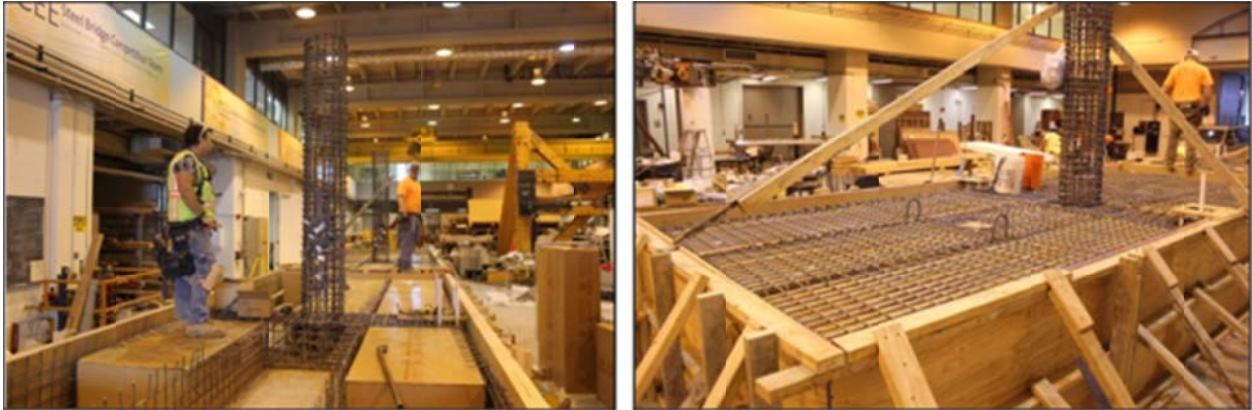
Installing custom-made cardboard boxes for box-section (left) and furnishing reinforcement steel mesh for the soffit slab (right)
